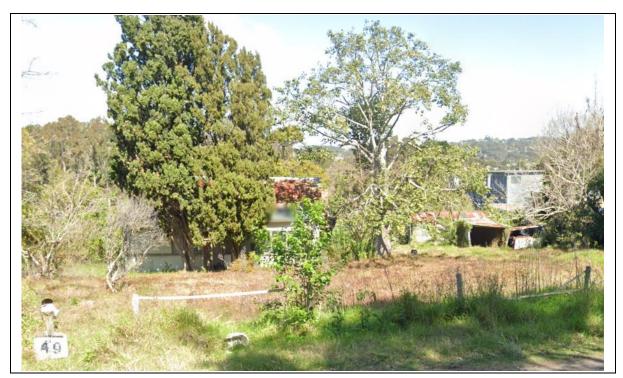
Existing Buildings and Structures on 49 Warriewood Road
